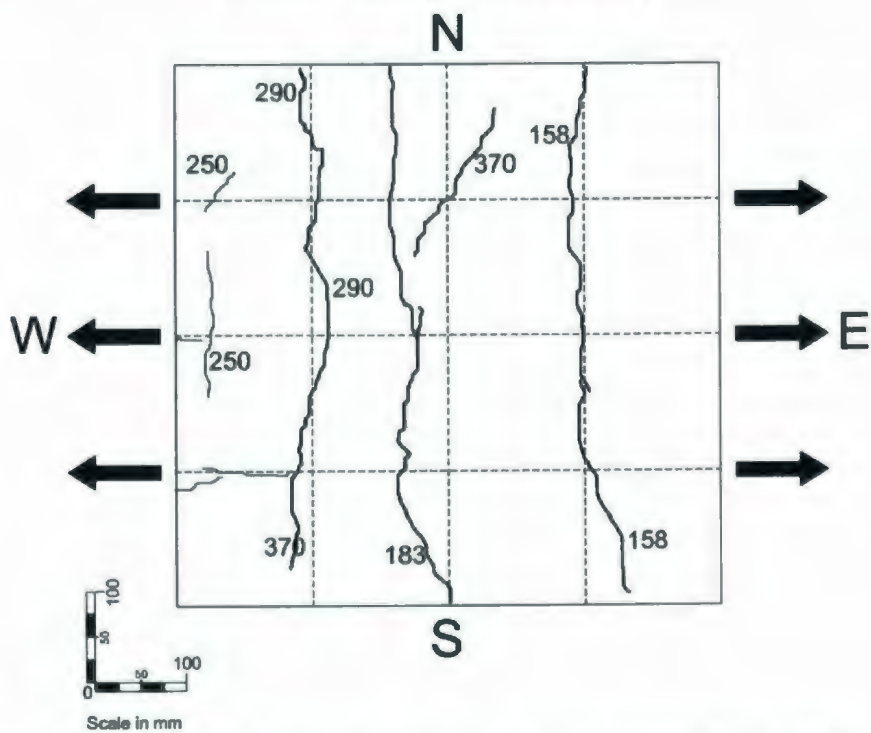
Stabilized crack pattern of panel P2-GNU-16-1.0-2.5
